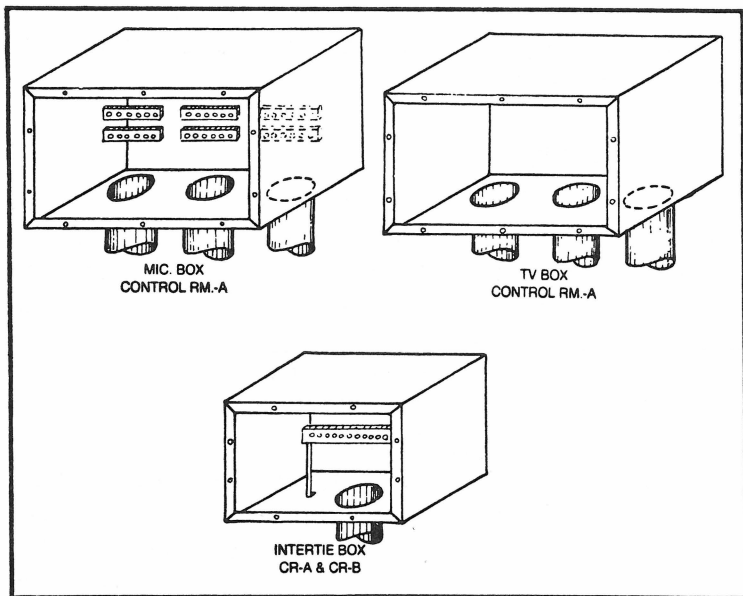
In control Room A the microphone box must terminate three conduits; the television box the same. An intertie box terminates the conduit connecting Control Room A and Control Room B.
